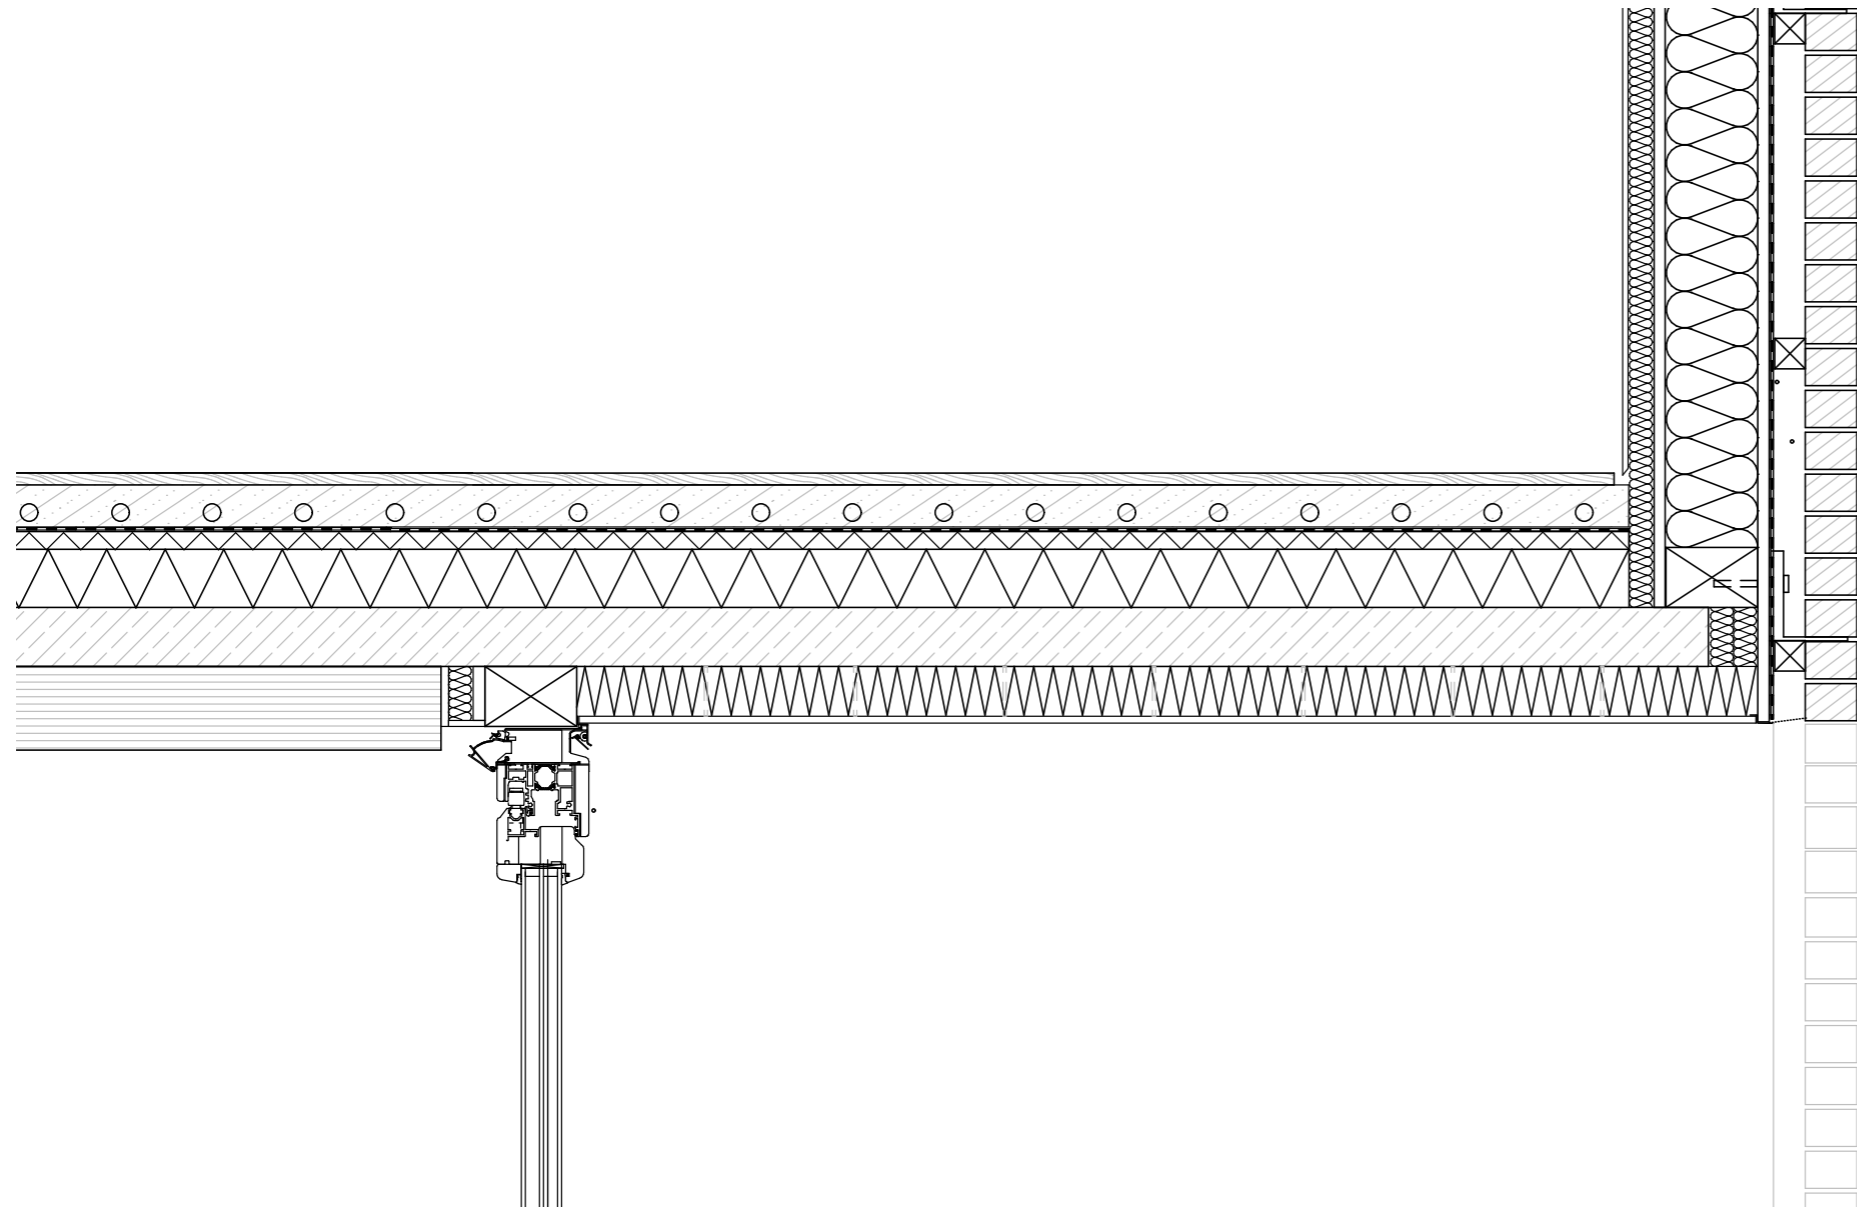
10 | Metatherm vertical sliding window system in timber facade connecting to wood-concrete composite floor
